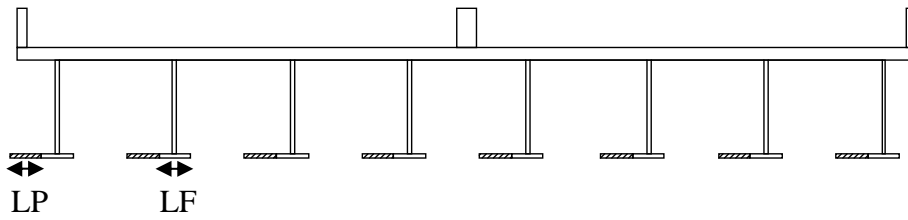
Illustration of horizontal plates installed on the bridge girders oriented towards the upstream direction with $LP = LF$ (Case H1)
